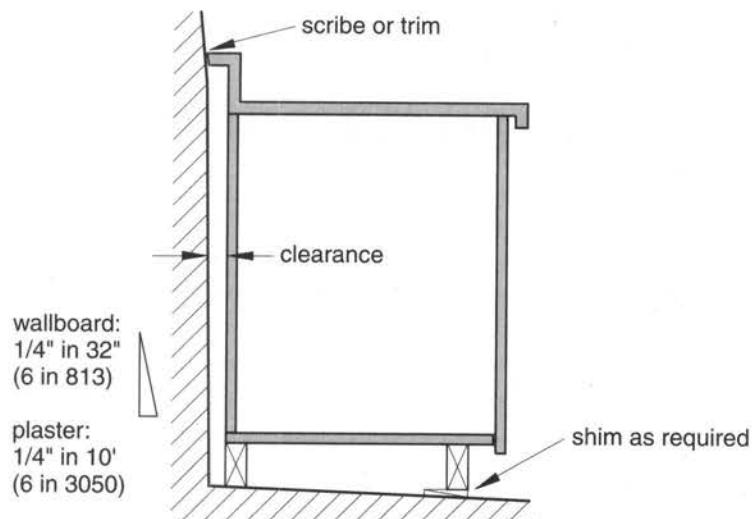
(a) and 16-6(b) schematically illustrate the places where typical cabinets must be matched to the surrounding construction. For upper cabinets and shelving, similar fits must also be made at the ceiling. Because most partitions are not exactly plumb or perfectly smooth, there should be a clearance behind the cabinet back so the cabinet only touches the partition at the countertop. The dimension of the clearance depends on the condition of the partition, but it is normally  $\frac{1}{8}$  in. to  $\frac{1}{2}$  in. (6 mm to 13 mm). In most cases, the top of the backsplash is built wider than necessary so it can be scribed to fit the outline of the partition when the countertop is installed. Any shimming required to level the cabinet must be concealed with a finish base.
